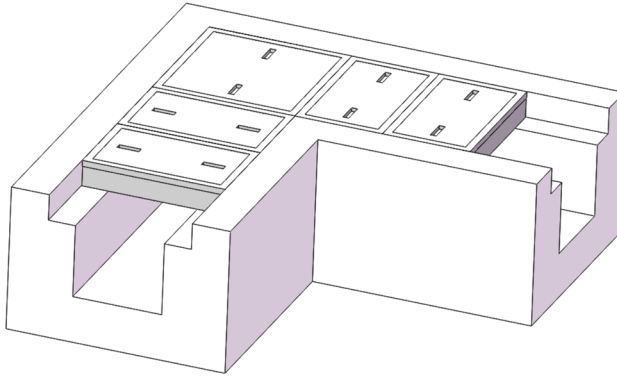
Installation schematic diagram of the concrete slab at the corner of the oil pipe trench.
